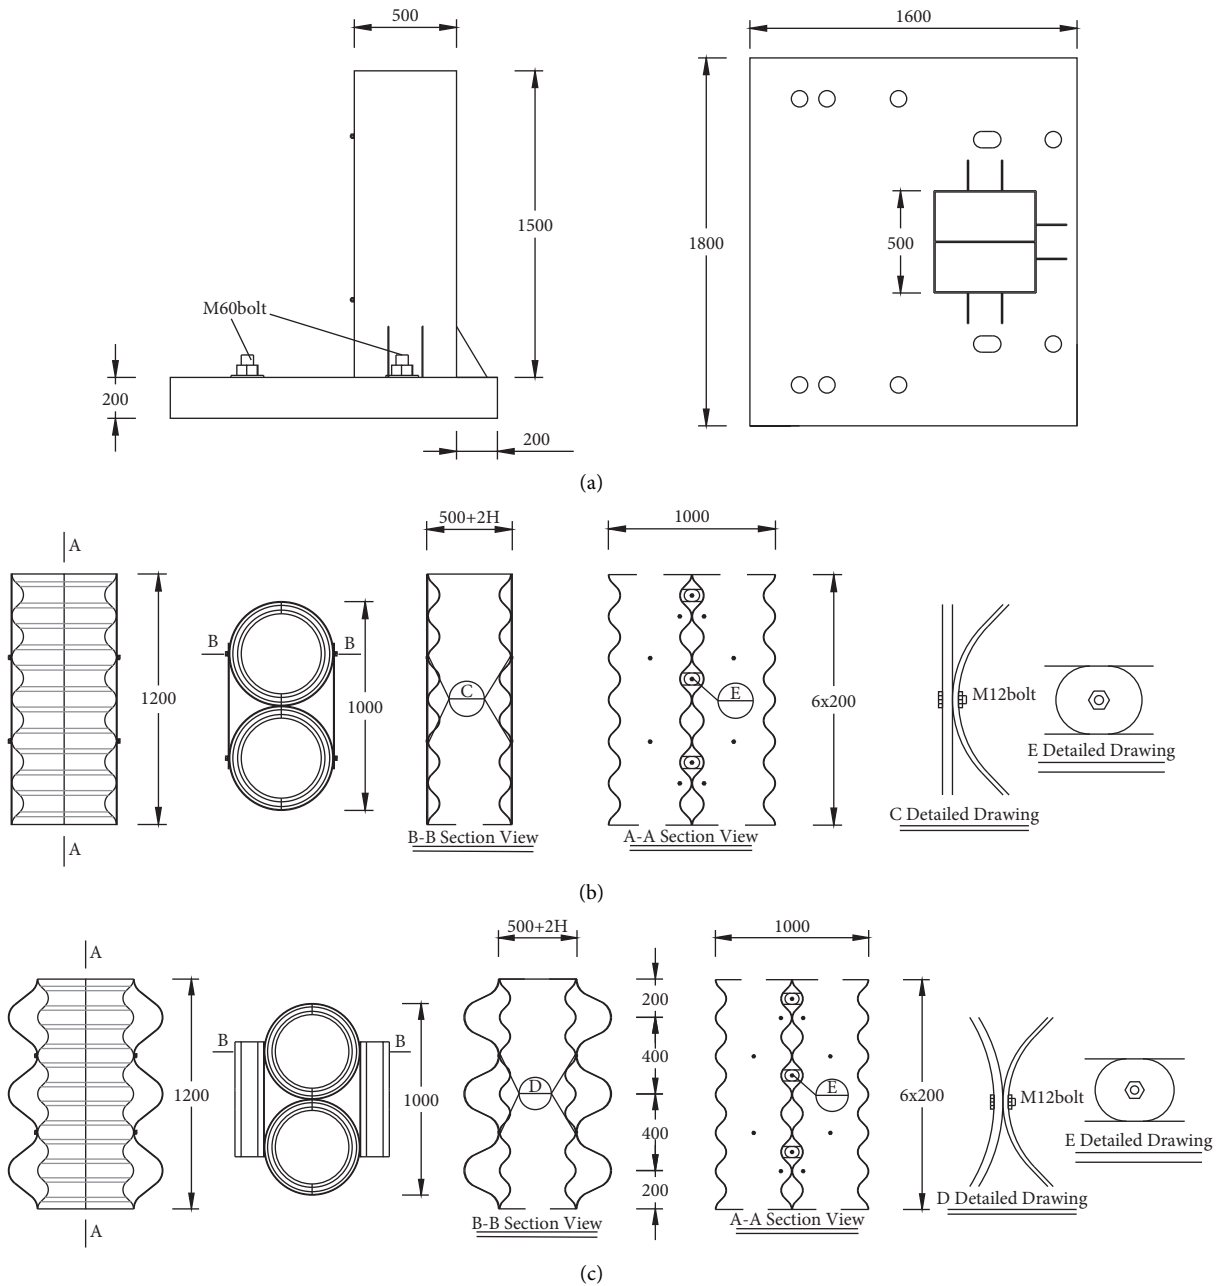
Geometry of the specimen (unit: mm). (a) CWACF-12.0 specimen geometry. (b) OSP specimen geometry. (c) CSP specimen geometry.
